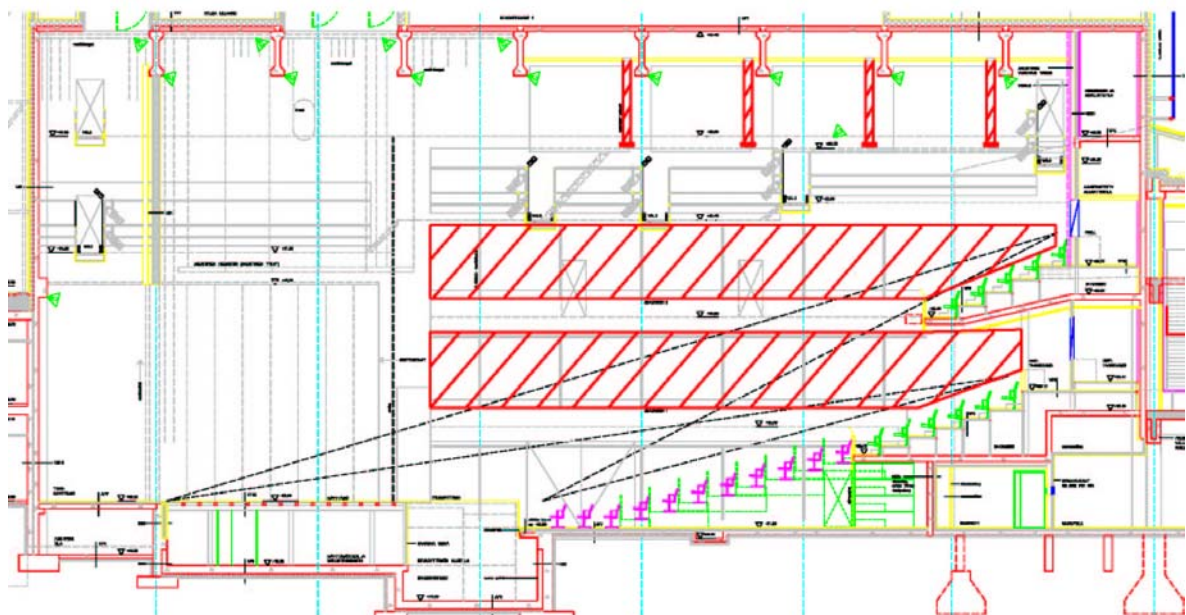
Placement of absorption curtains on side walls and transverse ceiling curtains
